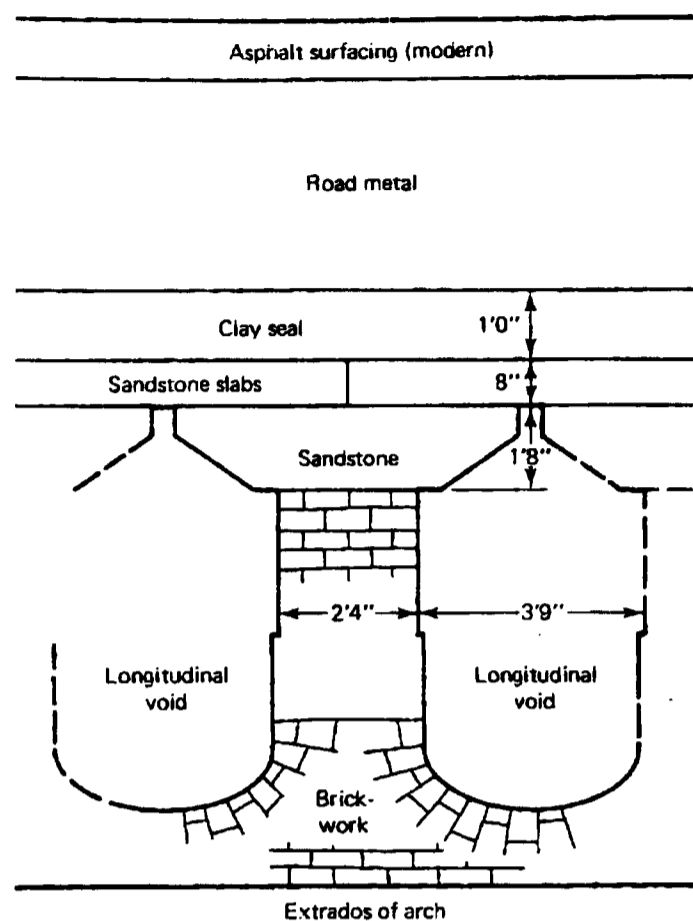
Cross section through spandrels of London Bridge (after Ruddock, 1979).
